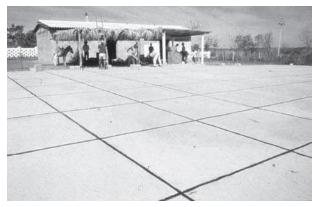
Final appearance of a drying concrete floor for cassava chips.
